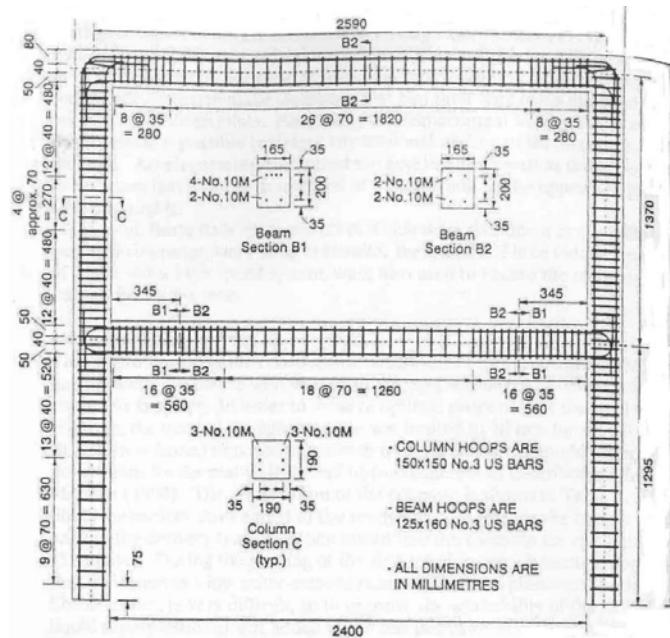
30: Reinforced steel layout of structure #1 frames from [40]
